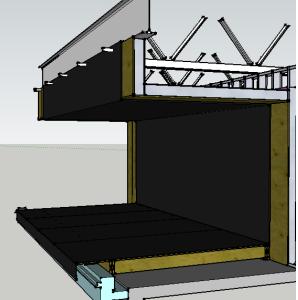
Virtual Mockup of Completed TWW Segment Photo Courtesy of Balfour Beatty Construction
